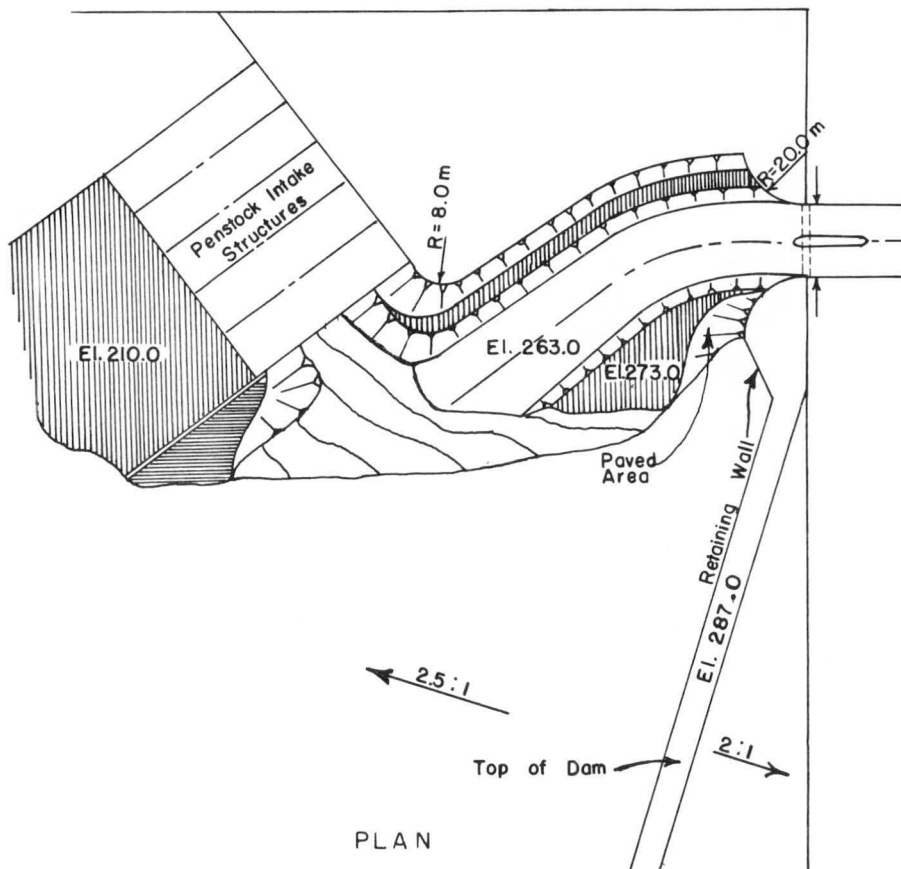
SPILLWAY APPROACH CHANNEL MODIFICATIONS (RECOMMENDED)
